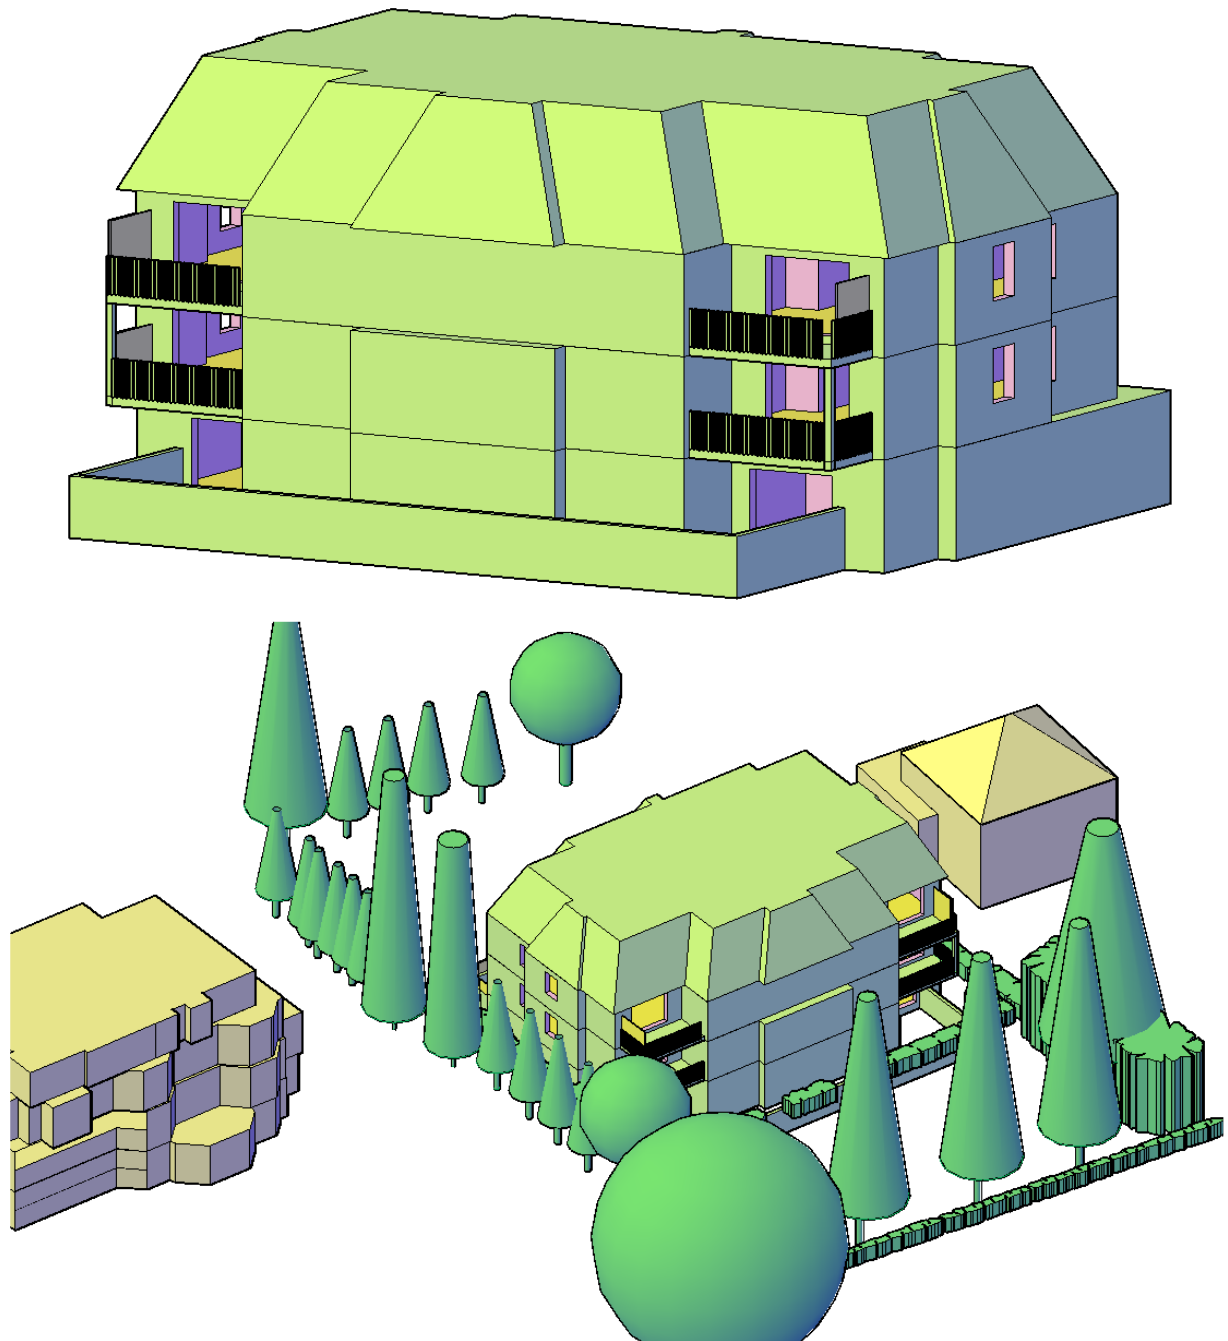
Aerial views of the daylight and sunlight model of the assessed rooms within the proposed development (top, southeast view; bottom, southwest view with surrounding buildings and trees)
